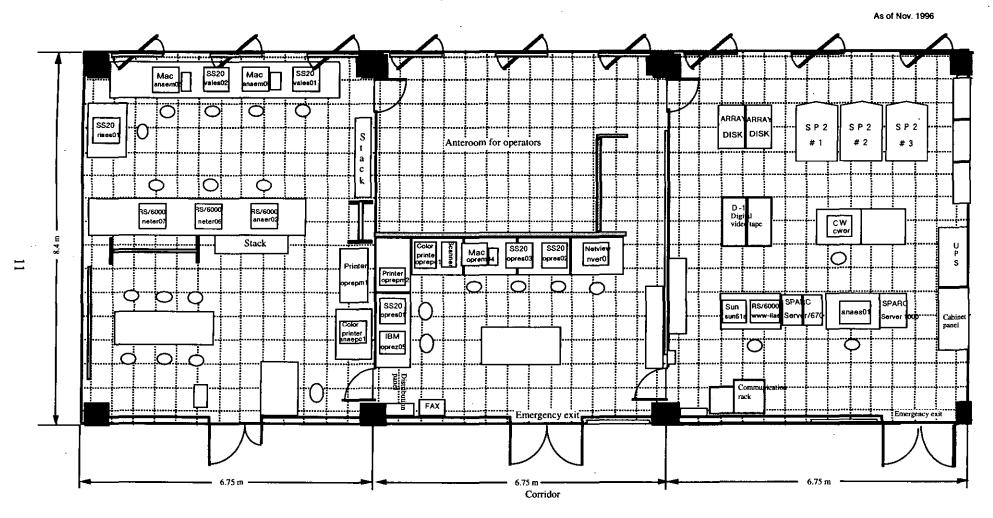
Layout of ILAS & RIS DHF, 3rd Floor of Main Research Building III
